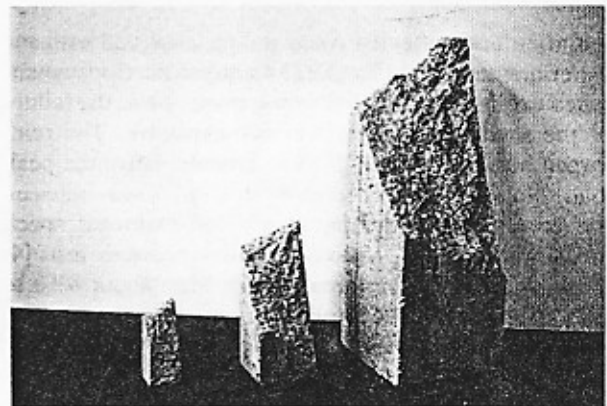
Photograph of the fracture surfaces of unreinforced specimens of different sizes.
